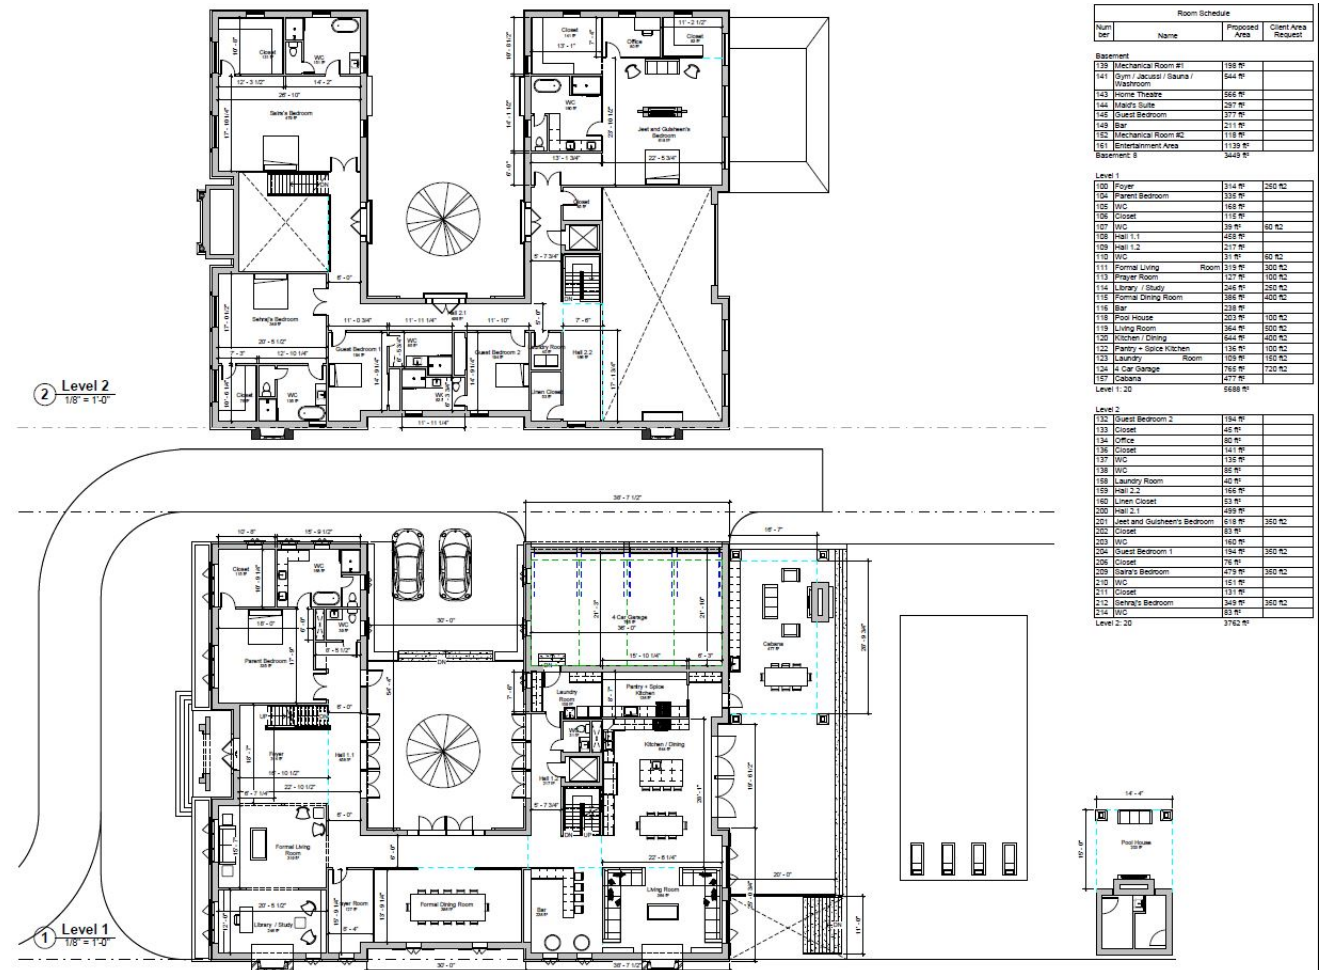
Floor Plans for the first and second stories, 2230 Mississauga Road. (Image from client.)
